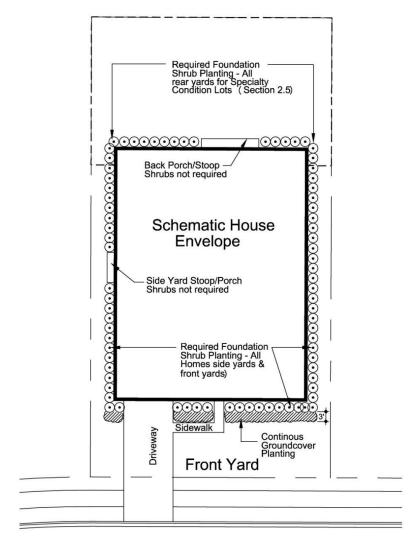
EXHIBIT H – REQUIRED FOUNDATION SHRUB PLANTING
